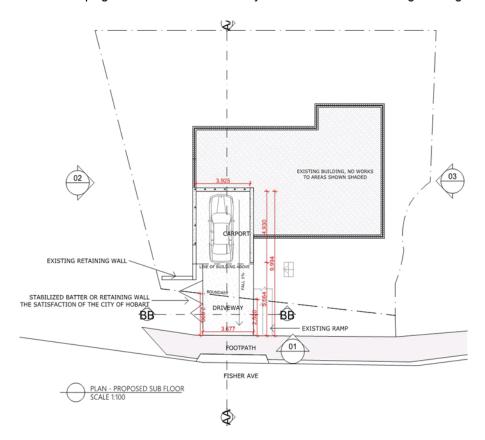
Proposed sub-floor plan illustrating proposed works in the Road Reserve.
